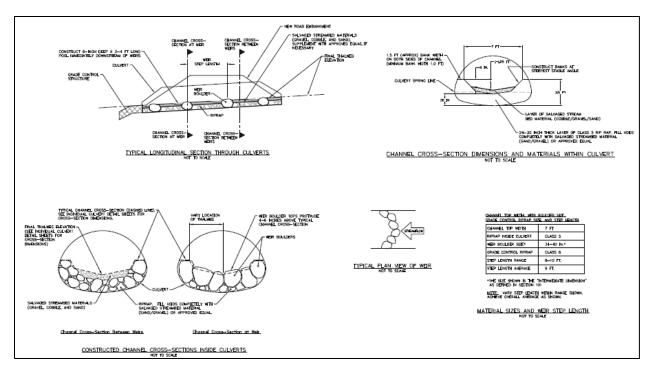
Typical drawings of longitudinal and horizontal cross sections through AOP culverts.
